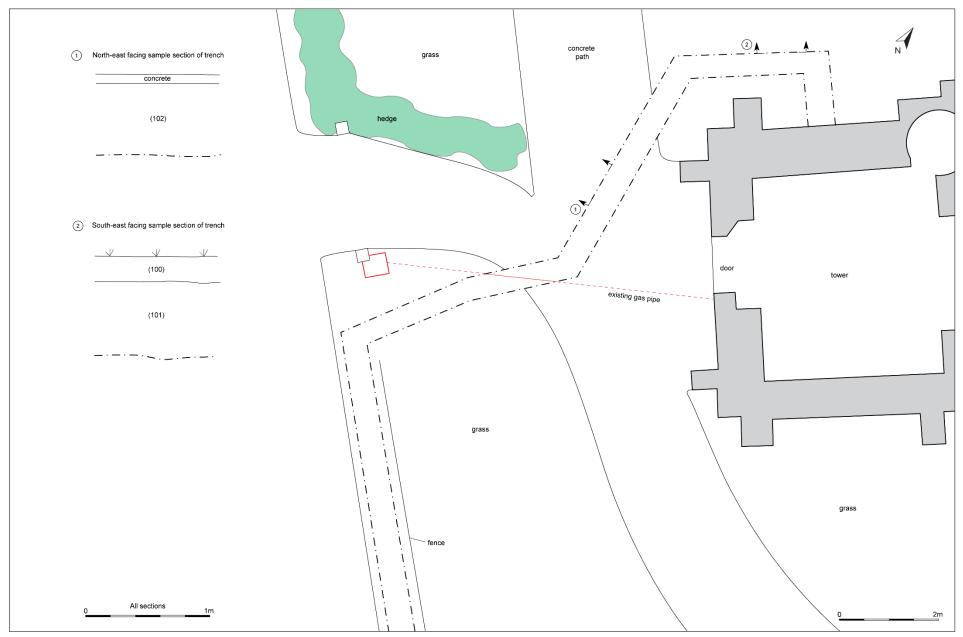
SAMPLE SECTIONS AND SITE PLAN SHOWING LOCATION OF TRENCH AND SURROUNDING AREA.
